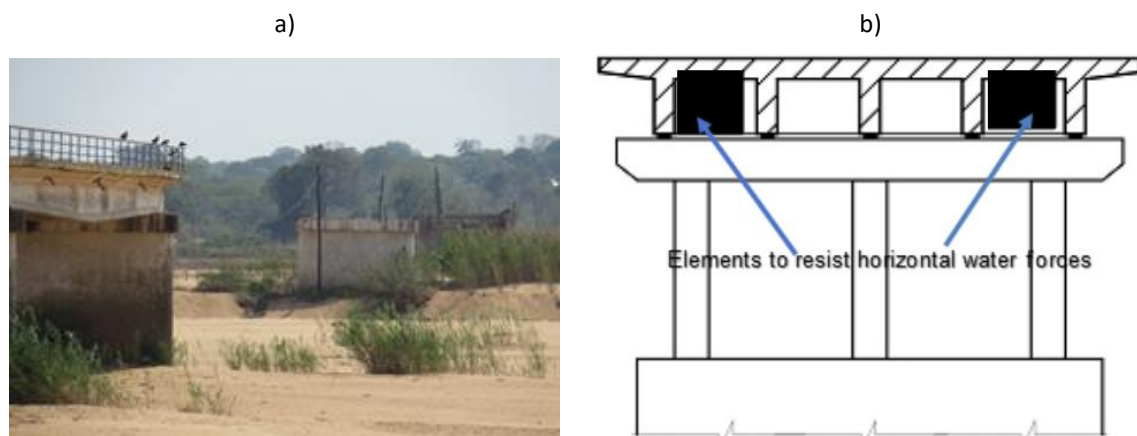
Strengthening of bridges to flooding in Mozambique. a) a bridge where its superstructure is lifted and washed away; b) adaptation measure for a bridge deck to resist water forces during a flood; ©ANE.
